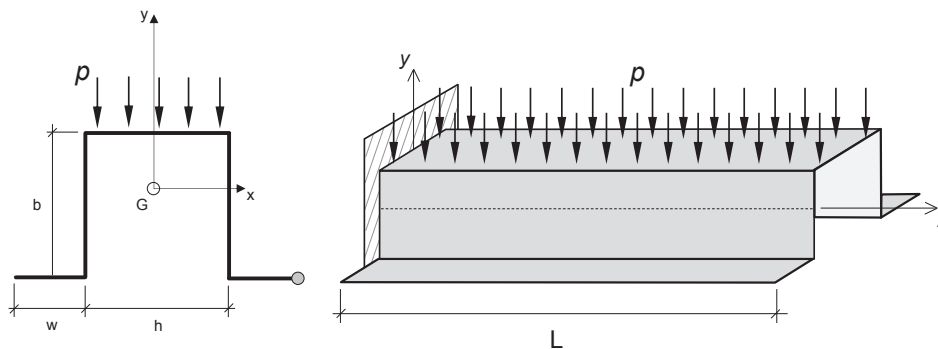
Isotropic case: a hat-section cantilever beam under transversal load.
